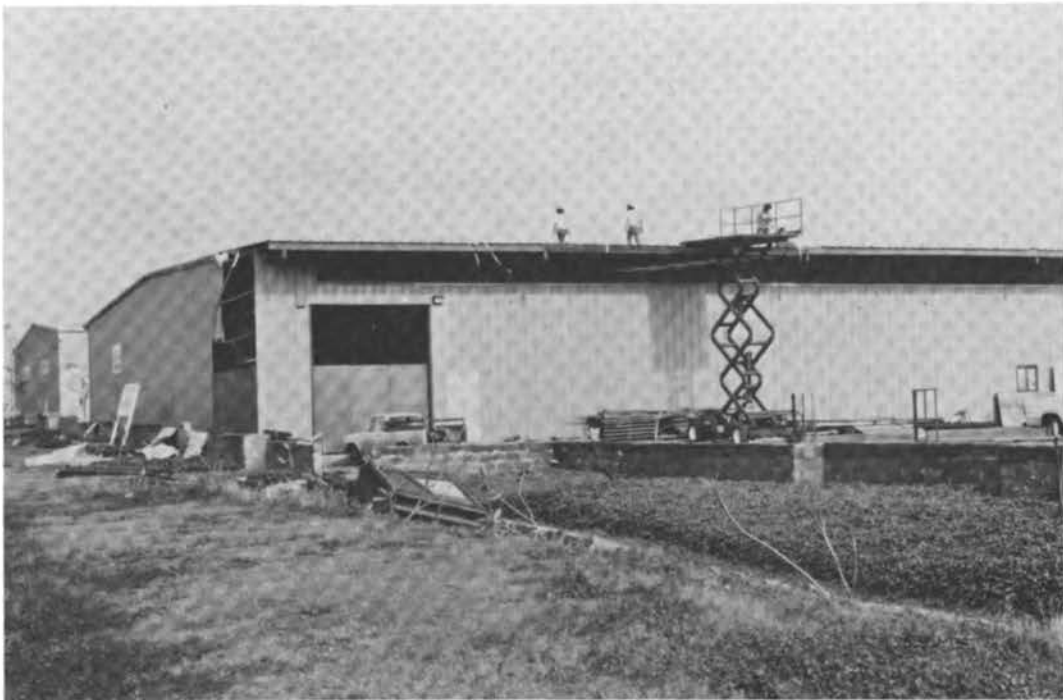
Damaged preengineered metal building at Kauai (note natural ventilation built into windward wall, damage sustained by roof and side wall, and roll-up doors blown off tracks).
